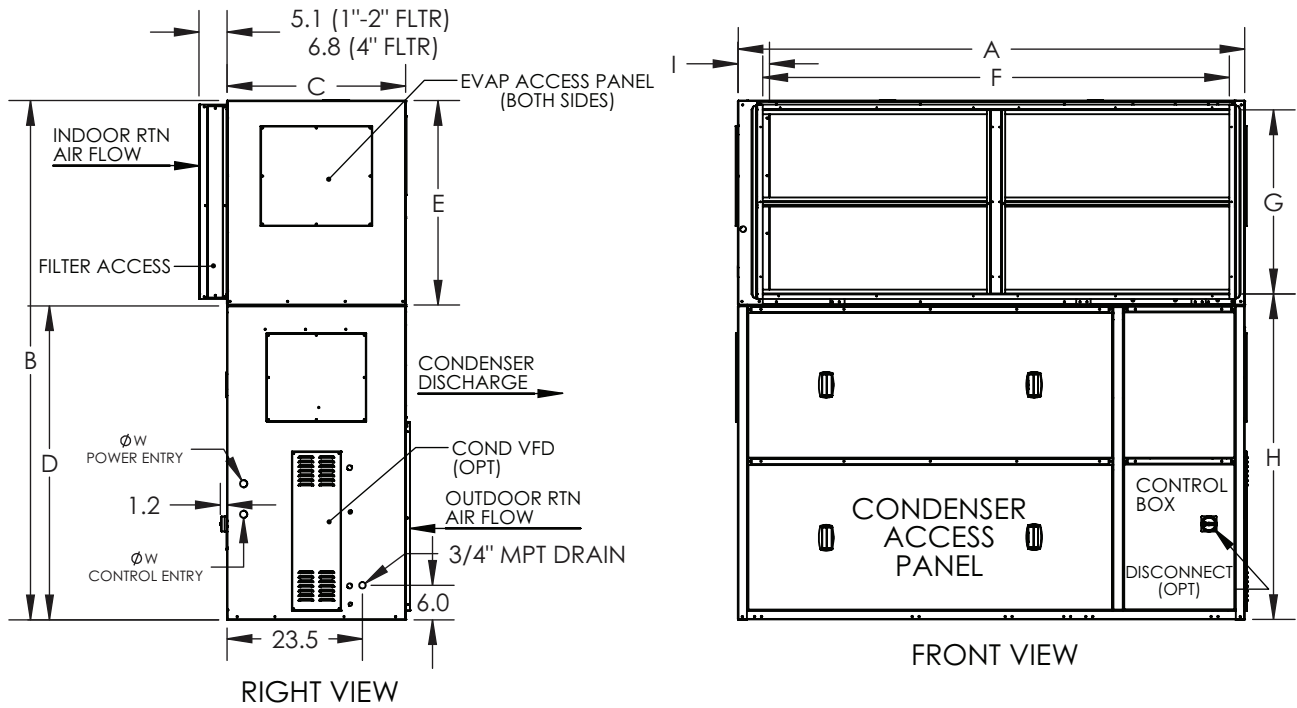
Base Unit Dimensions – 50XCA16, 24 (Rear Return, Horizontal Discharge)
